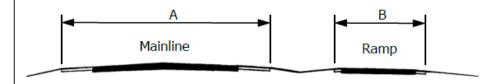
Approach roadway cross-section view for a mainline and a ramp that are carried across separate bridges.
